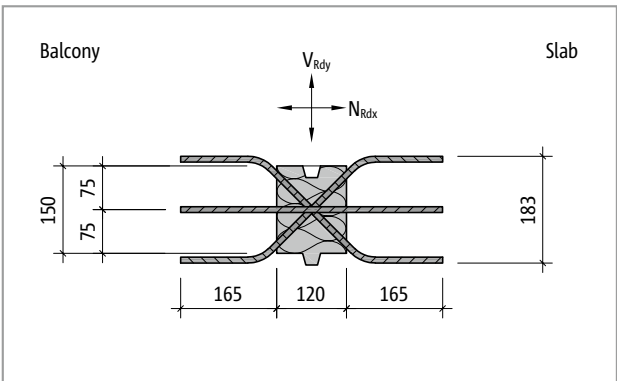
Schöck Isokorb® XT type H-VV1-NN1: Product plan view
